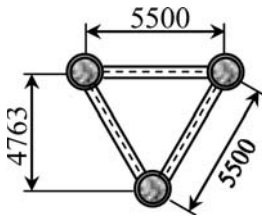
Cross-section of arch ribs of second Saikai bridge.
